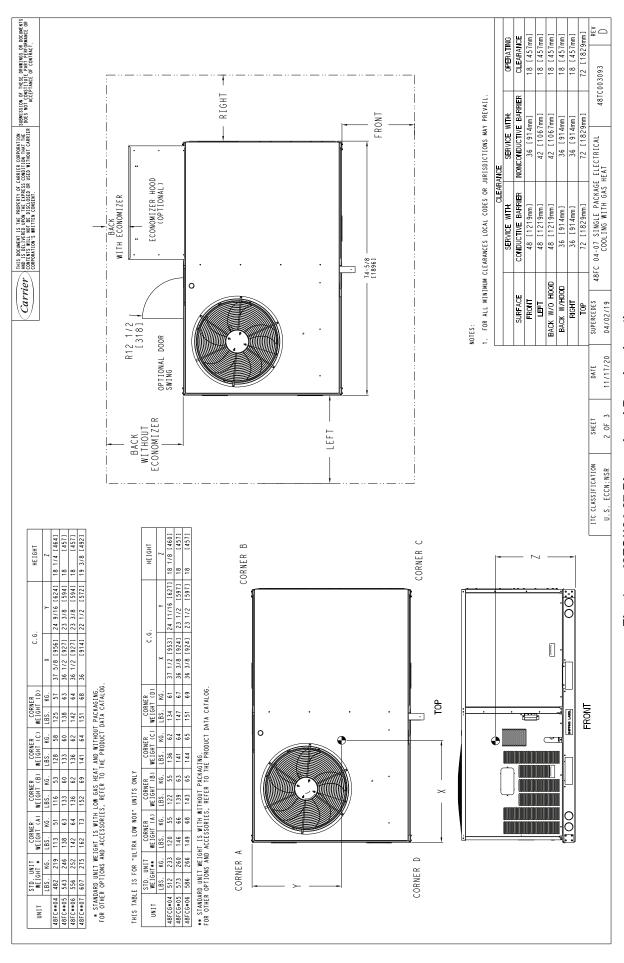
48FC04-07 Dimensional Drawing (cont)
